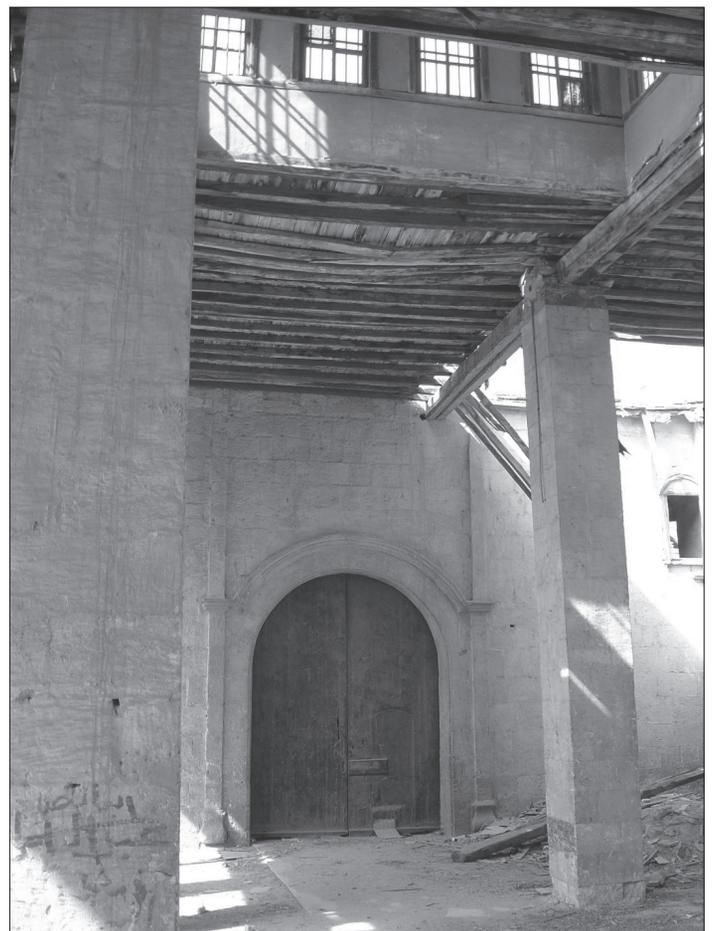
Citadel Arsenal, central section, view of a workshop hall with an interior gate built in the Rumi style.
